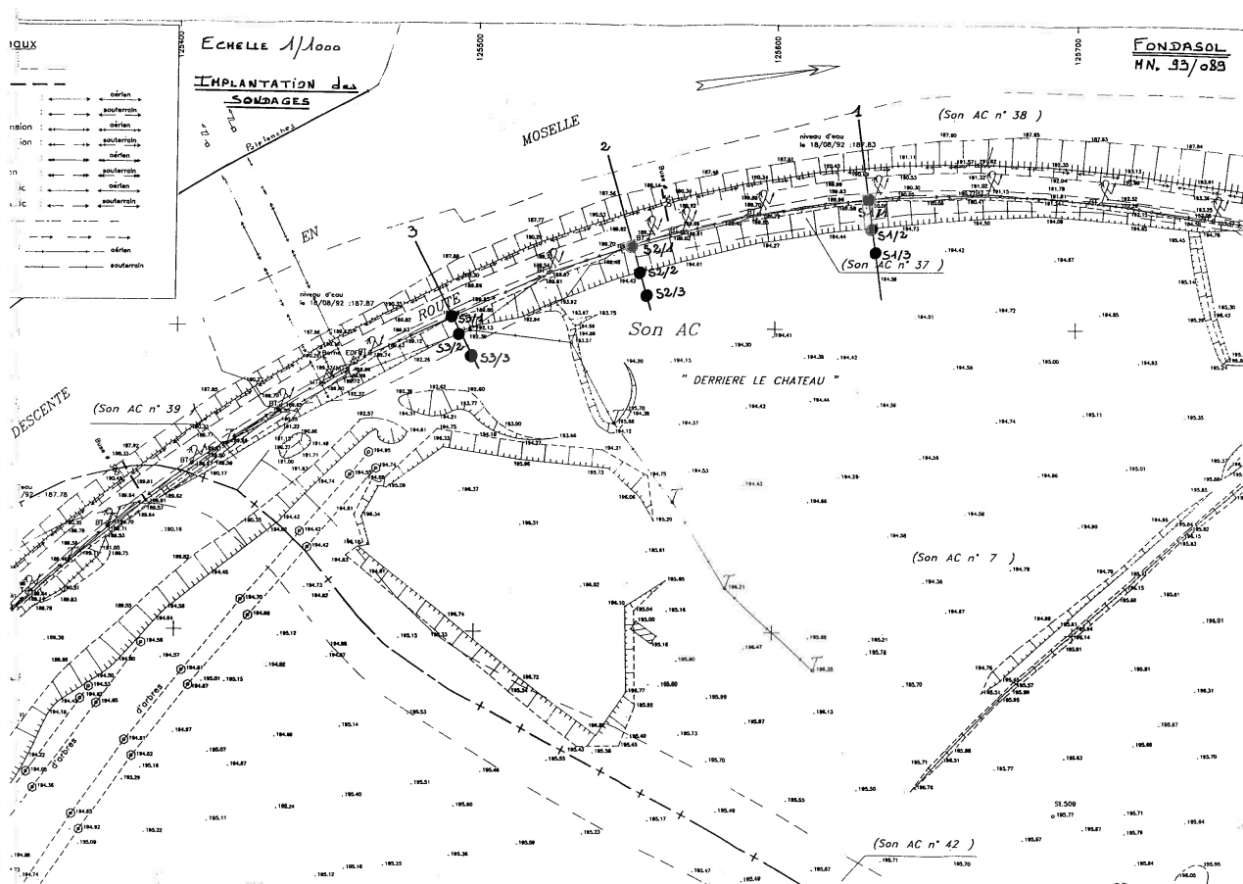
Location of drilling (S1,S2,S3) for the geotechnical surveys (geotechnical stability assessment for access road widening) (FONDASOL, 1993)
